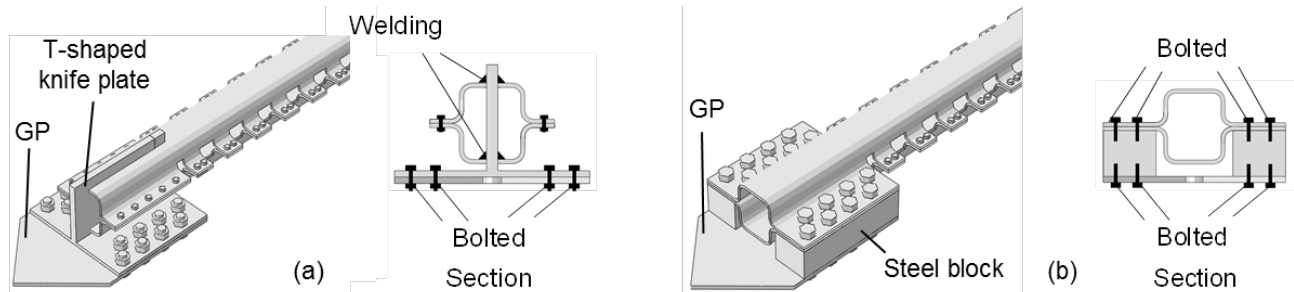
Detail configurations of the proposed connection: (a) T-shaped connection; (b) steel block connection
